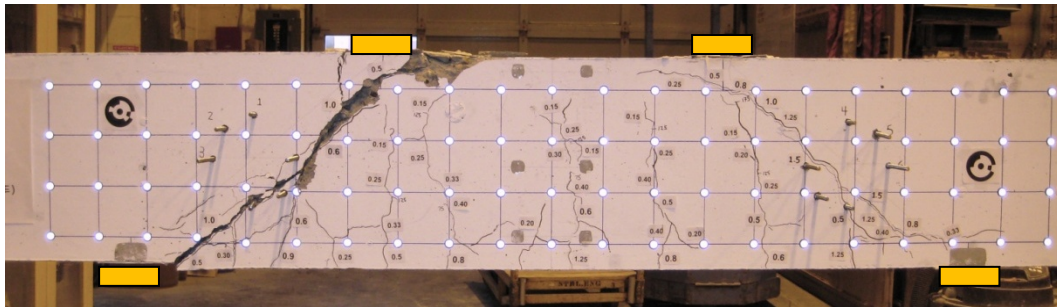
Failure in shear span A as seen after removal of specimen A2N from testing machine.
